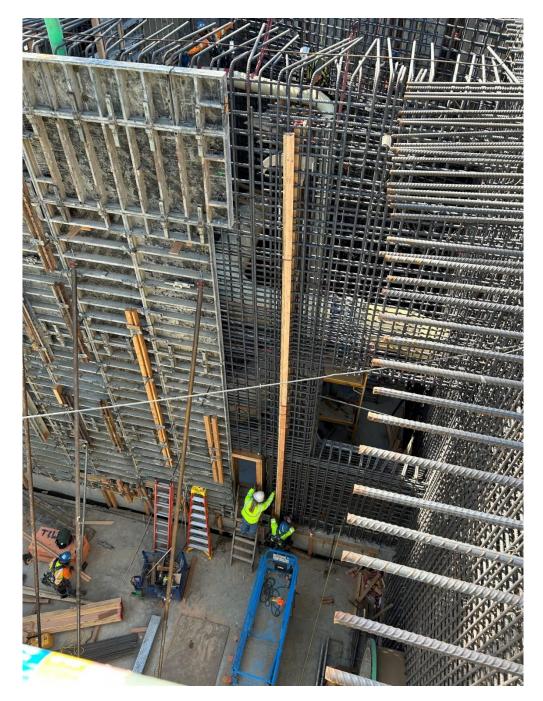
Installation of concrete formwork at the bottom of the Effluent Weir Structure wall
